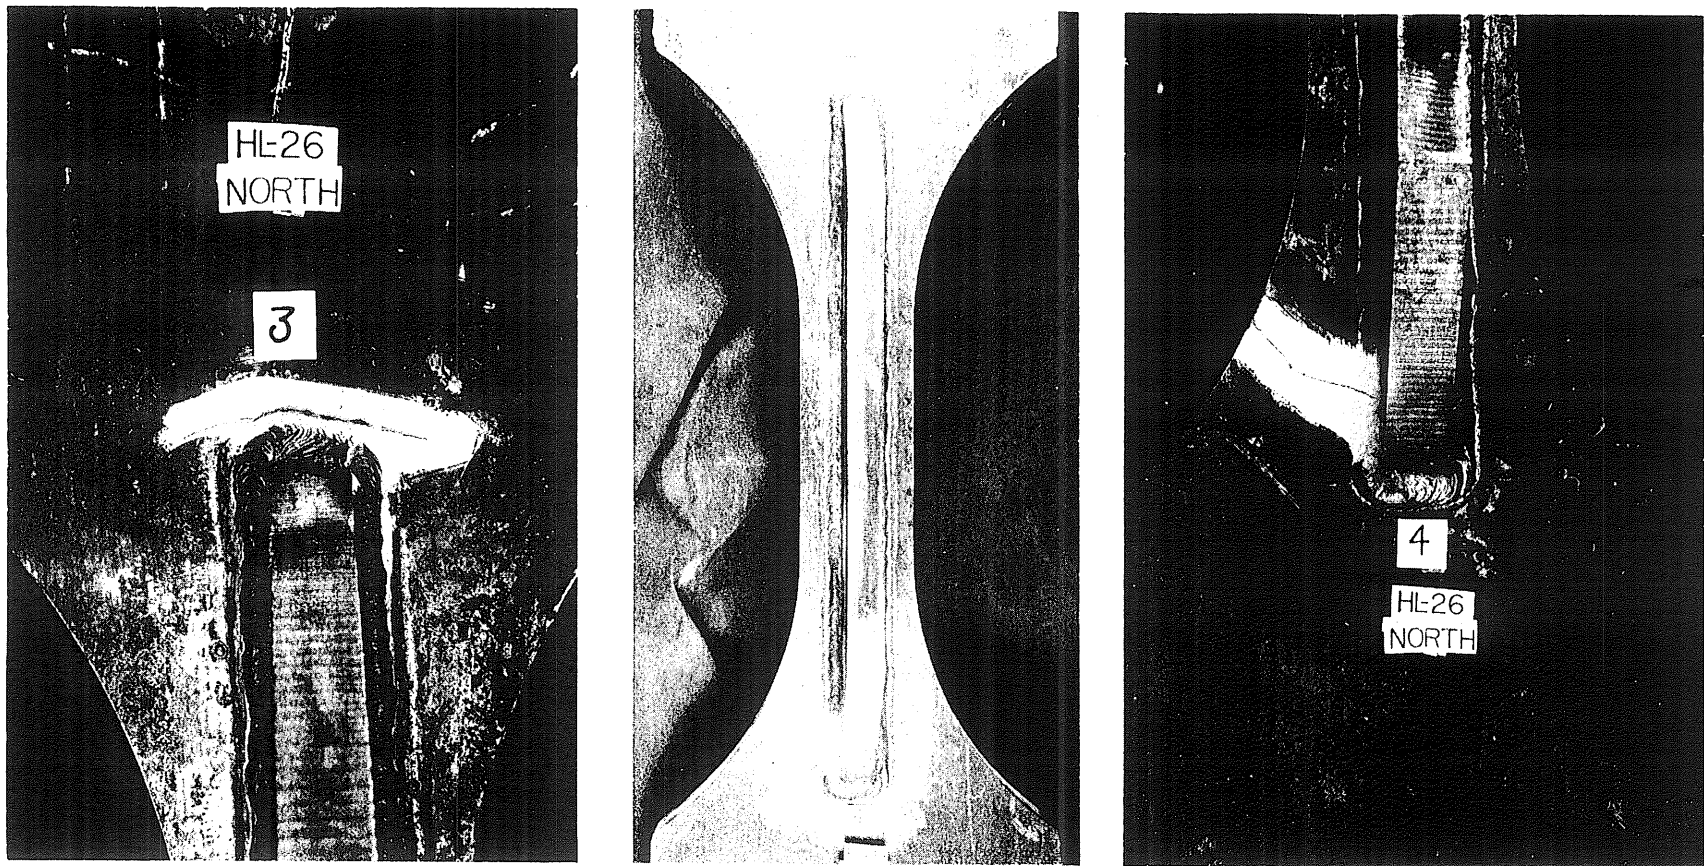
FATIGUE CRACKS IN A SPECIMEN WITH LONGITUDINAL FILLET WELDED ATTACHMENTS ON TWO SIDES—NORTH FACE.
